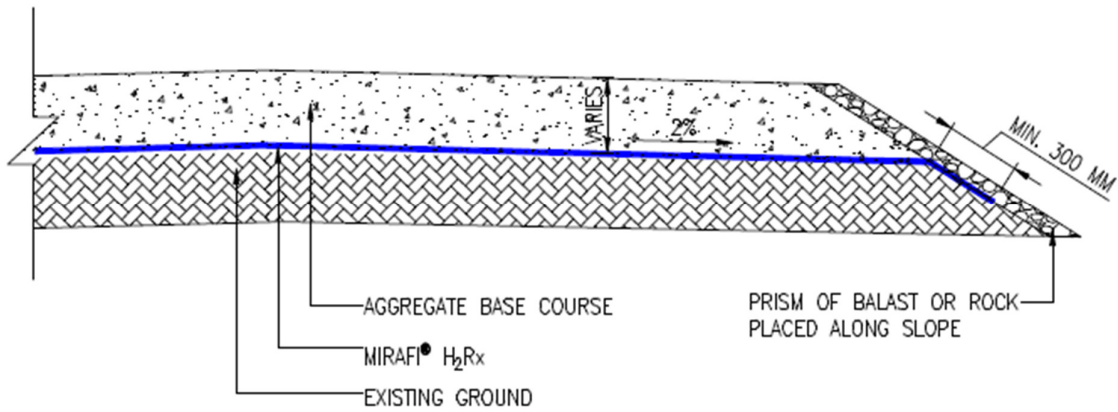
(a): A typical cross section diagram for geotextile edge terminated as a draped tongue beneath a rock cover.
